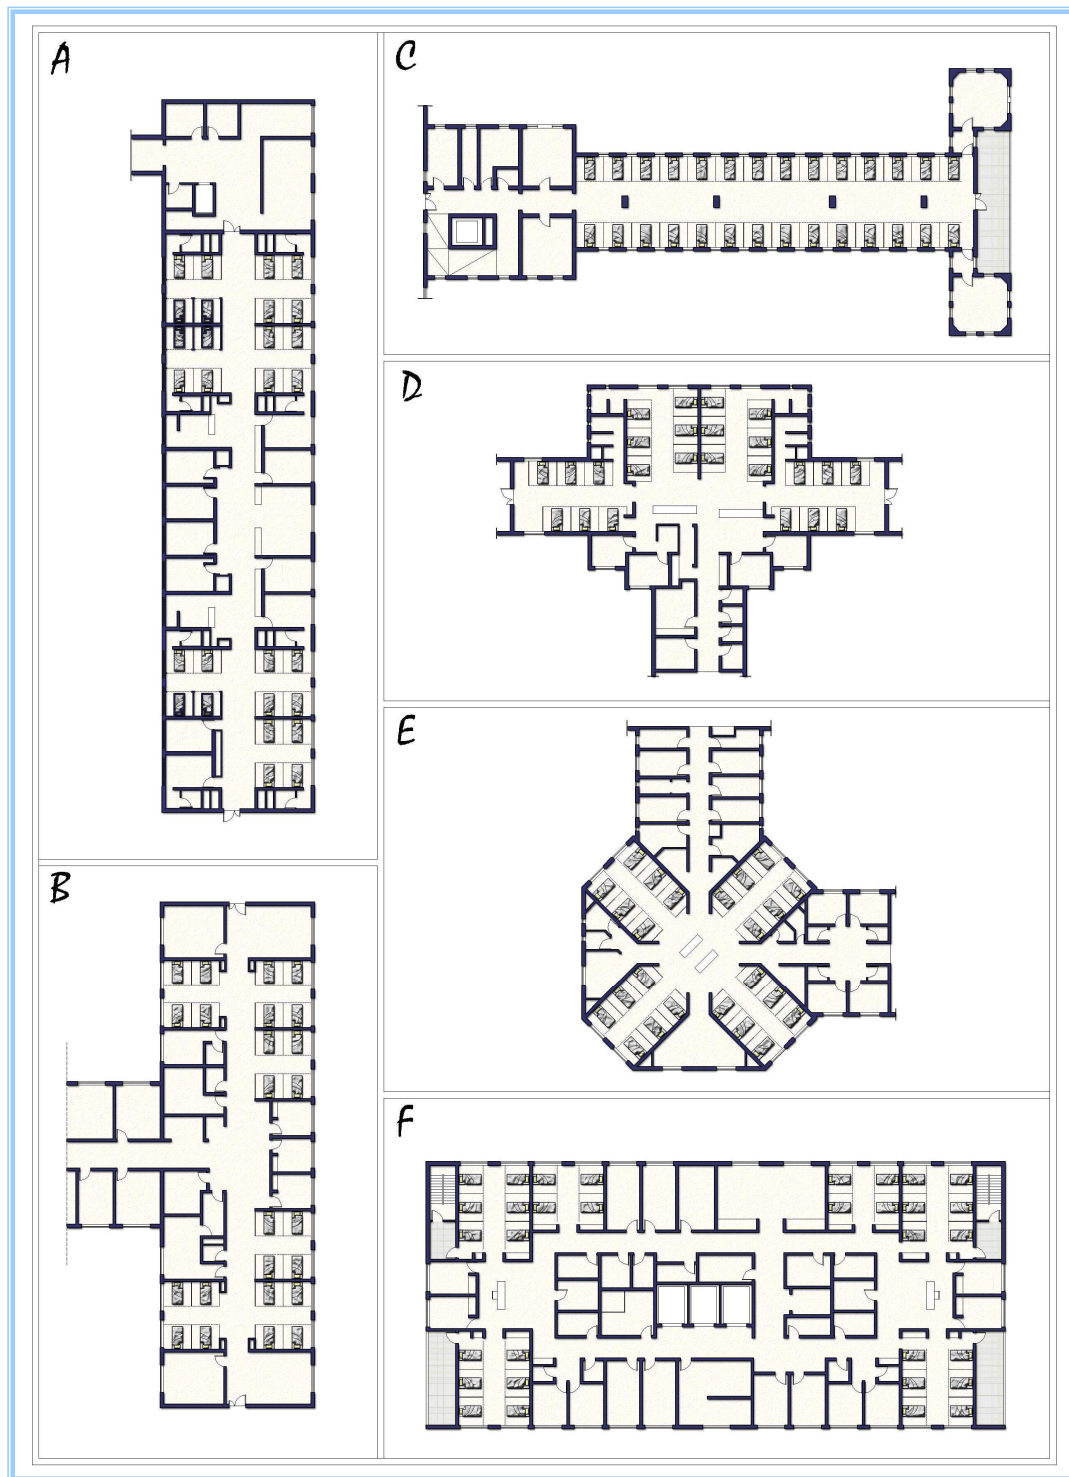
Wards layout after redrawing them using Auto CAD.
